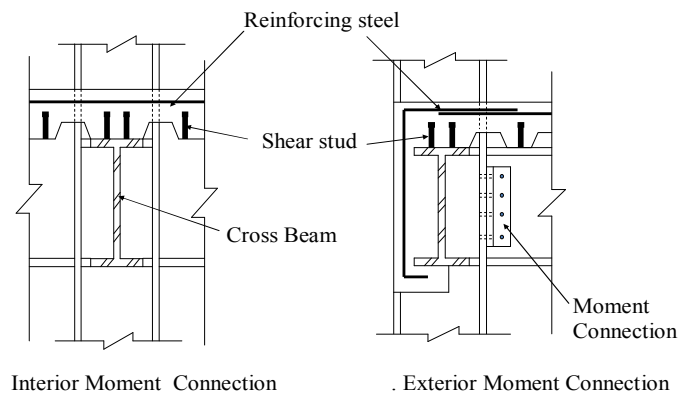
Composite Slab Connection Moment-connected Steel Frame
